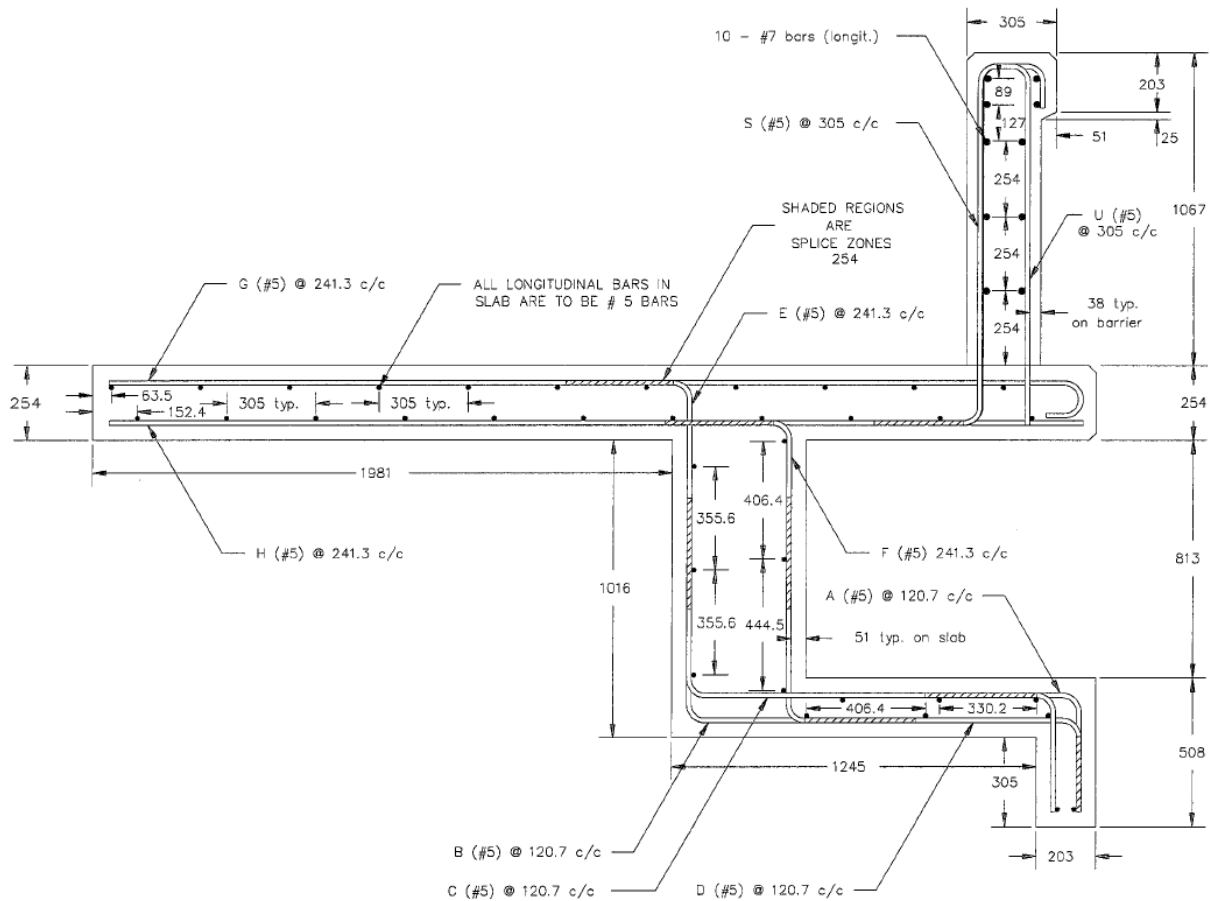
TL-5 1.07-m Vertical Wall Bridge Railing [16]
